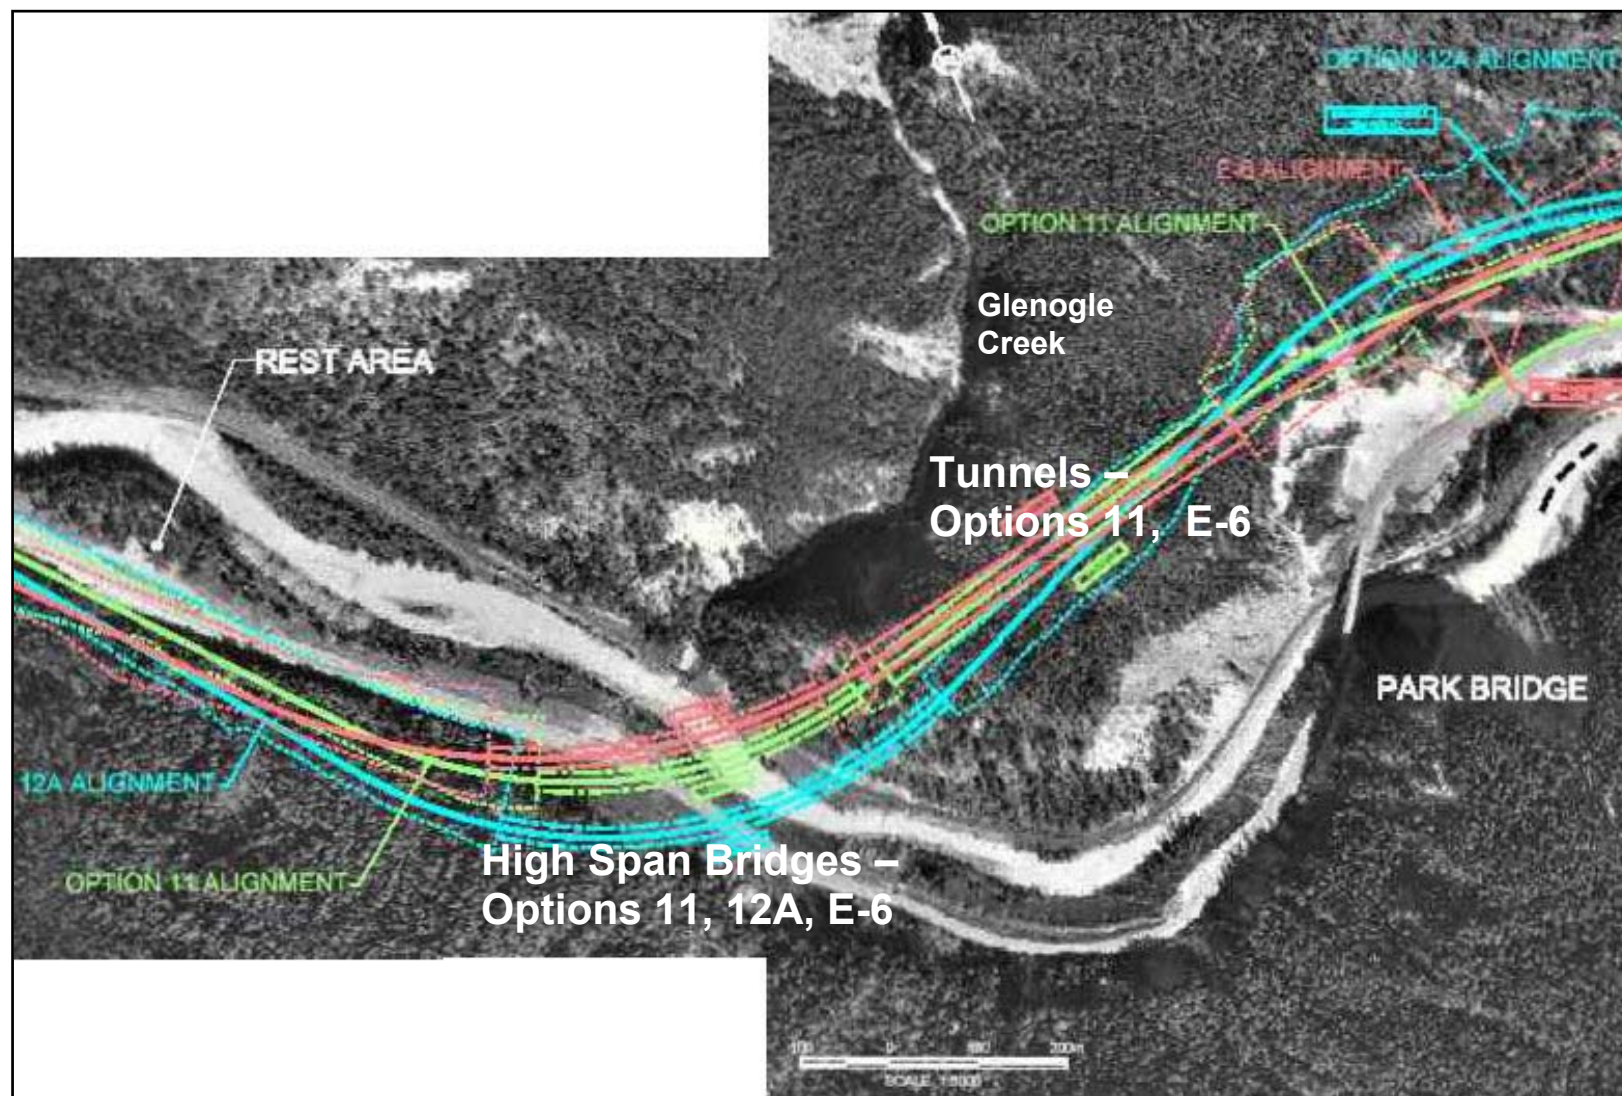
Possible bridge and tunnel system to replace Park Bridge crossing of Kicking Horse River.
